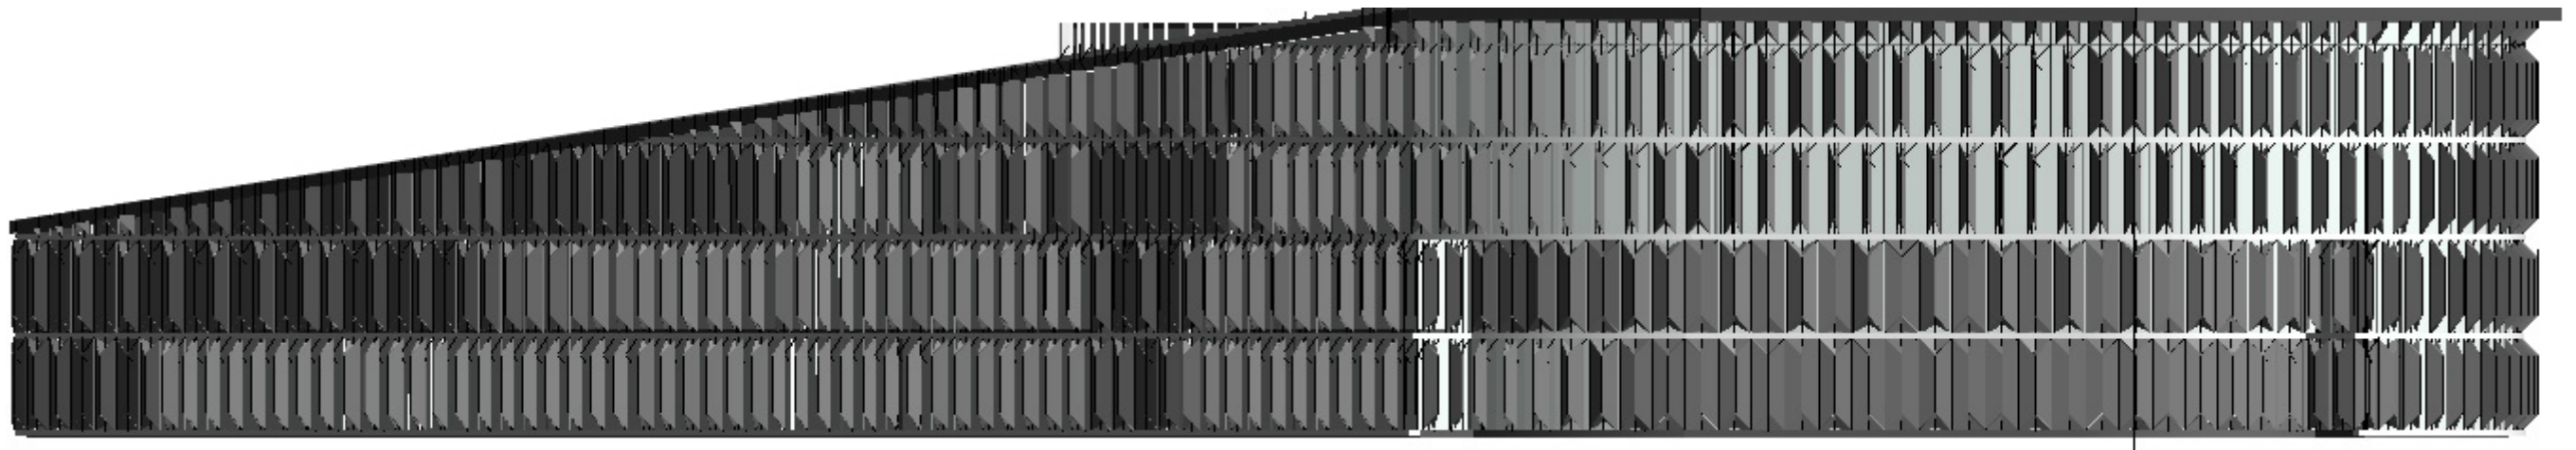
Elevation B with optimal kinetic facade pattern at 3 pm.
